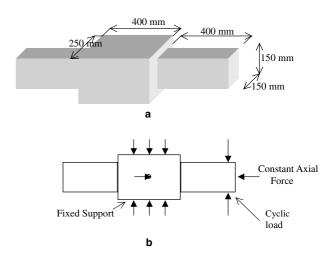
(a) Dimensions of test specimens and (b) schematic test setup.
